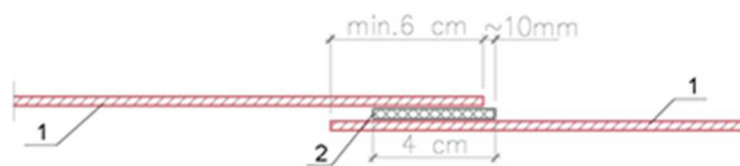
CROSS-CONNECTION OF MEMBRANE STRIPS – CROSS-SECTION
